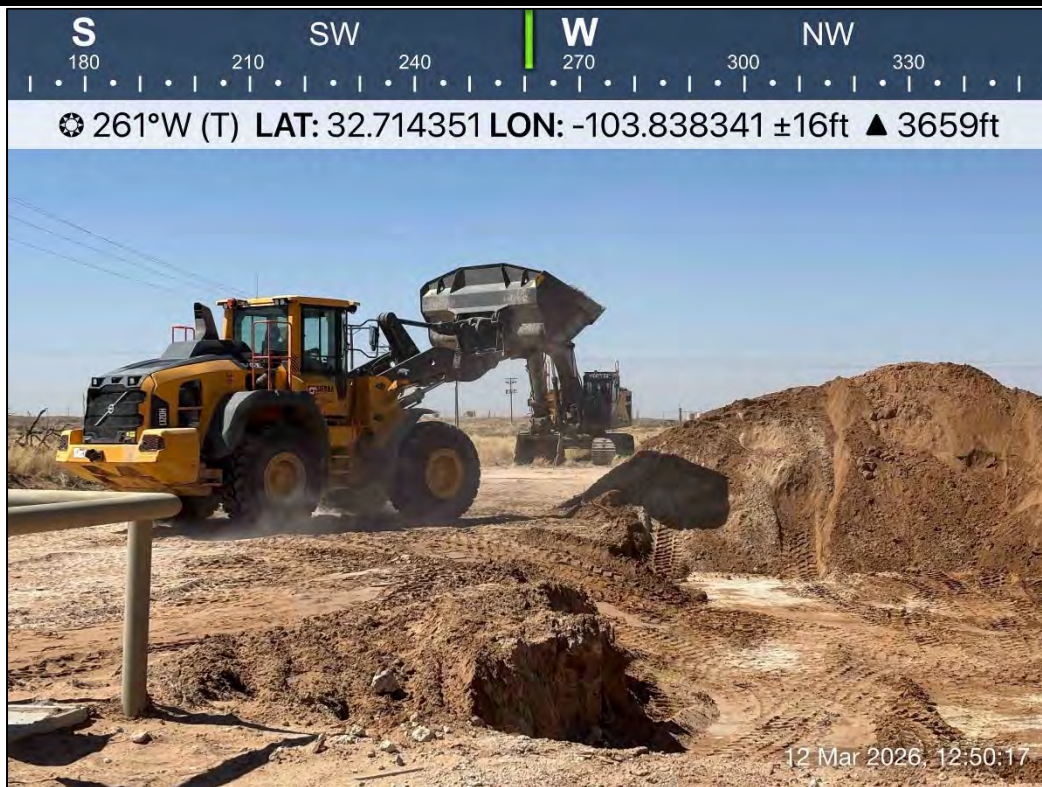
Southwestern view during excavation activities. 3/12/2026
